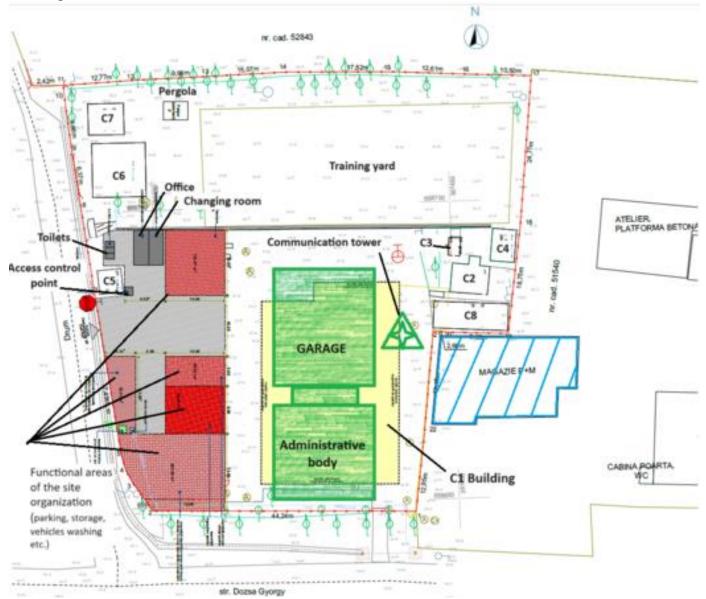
The existing buildings and the proposed positioning of the new on the land plot of the unit.
